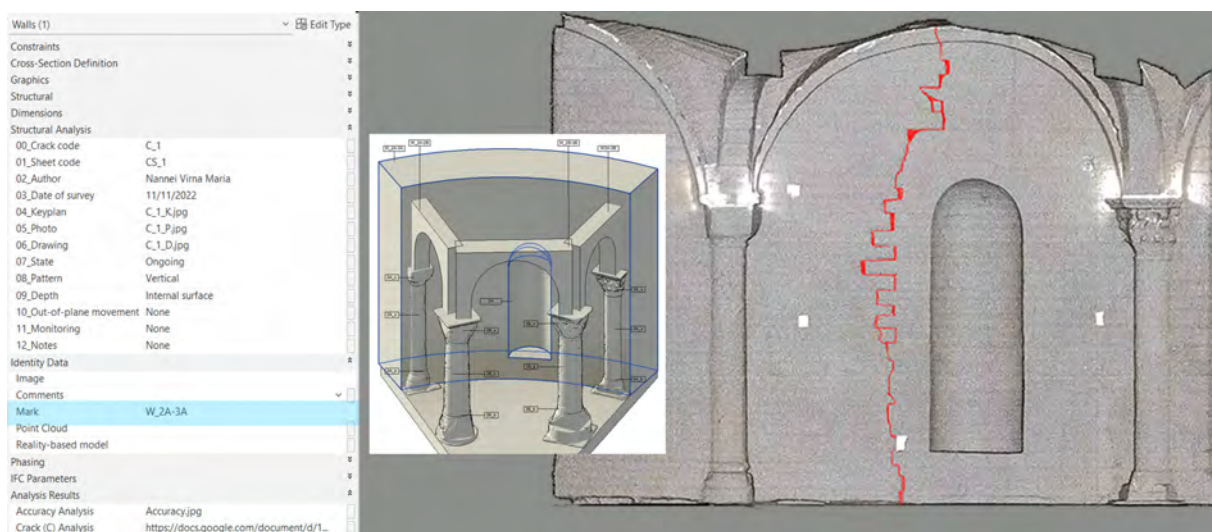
Crack analysis of section 2 walls. (@V.M. Nannei).
